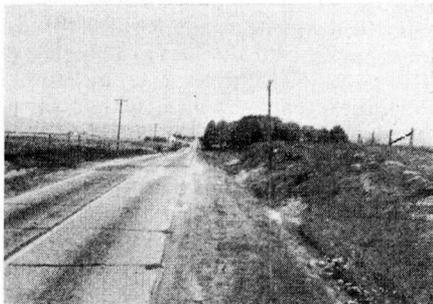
A section of U. S. Highway No. 41 located on silty clay (age and design the same as those of the pavement shown in Fig. 10).
